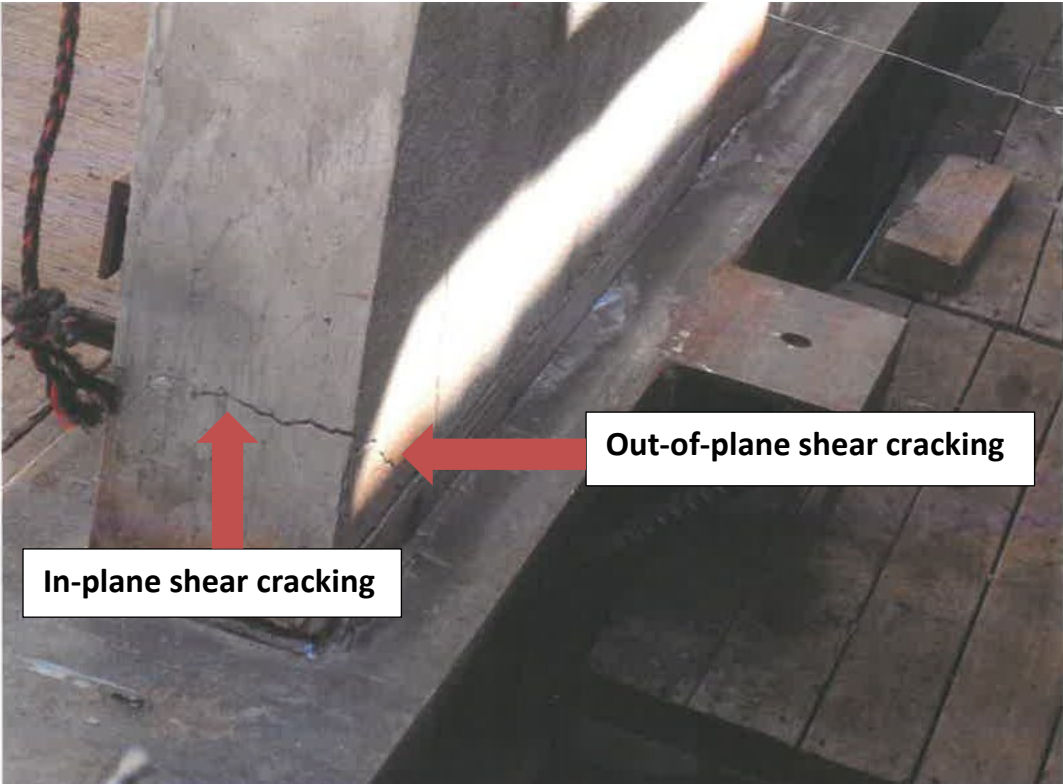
In-plane and out-of-plane crack evolution in compressive test specimens after failure
